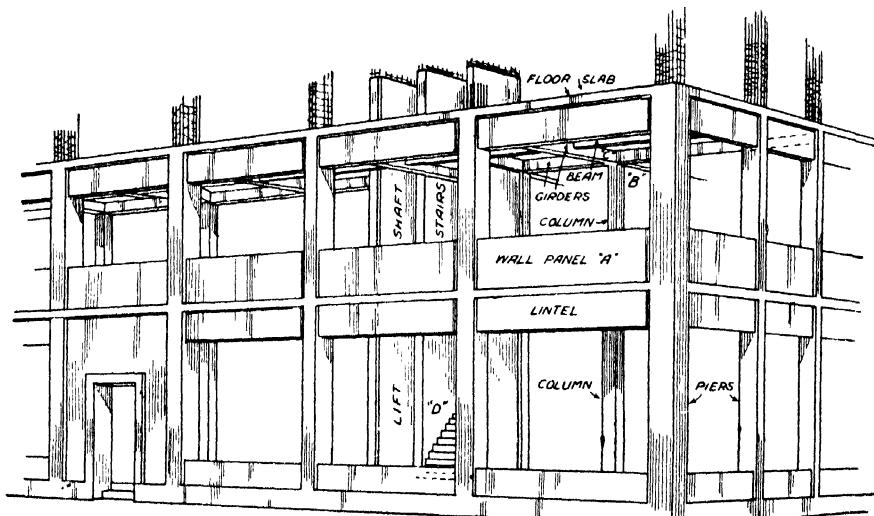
GENERAL CONSTRUCTION OF A REINFORCED-CONCRETE BUILDING
